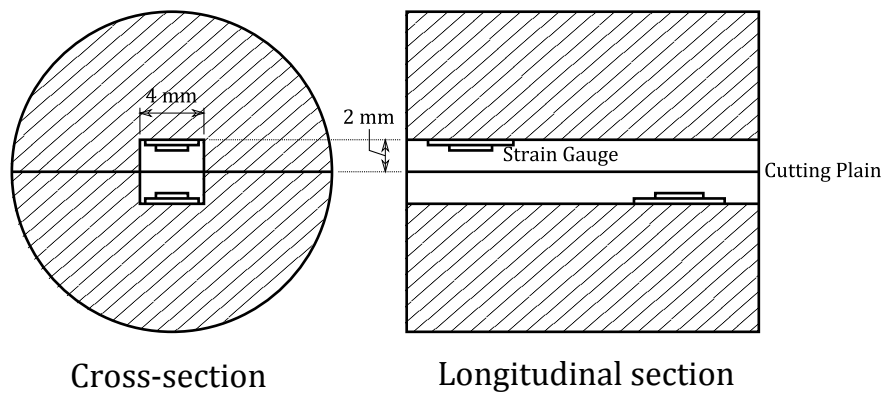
Sections of a gauged reinforcing bar (not to scale).
